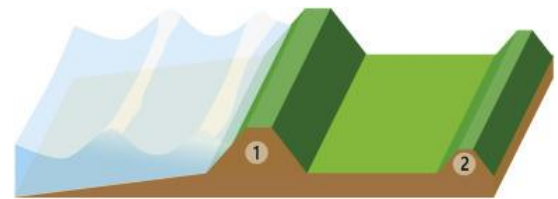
Inlaagdijk cross-section (Marijnissen, Kok, Kroeze, & Loon-steensma, 2021)
